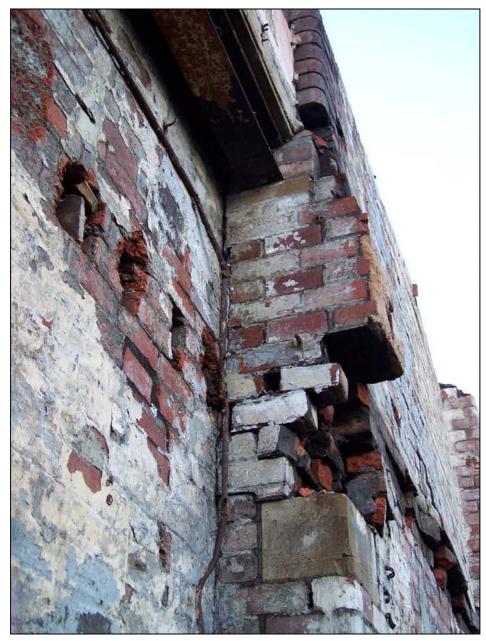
Detail of bull nosed brick jamb, north wall of former F4 – also note modern brickwork below (film D. 26)
